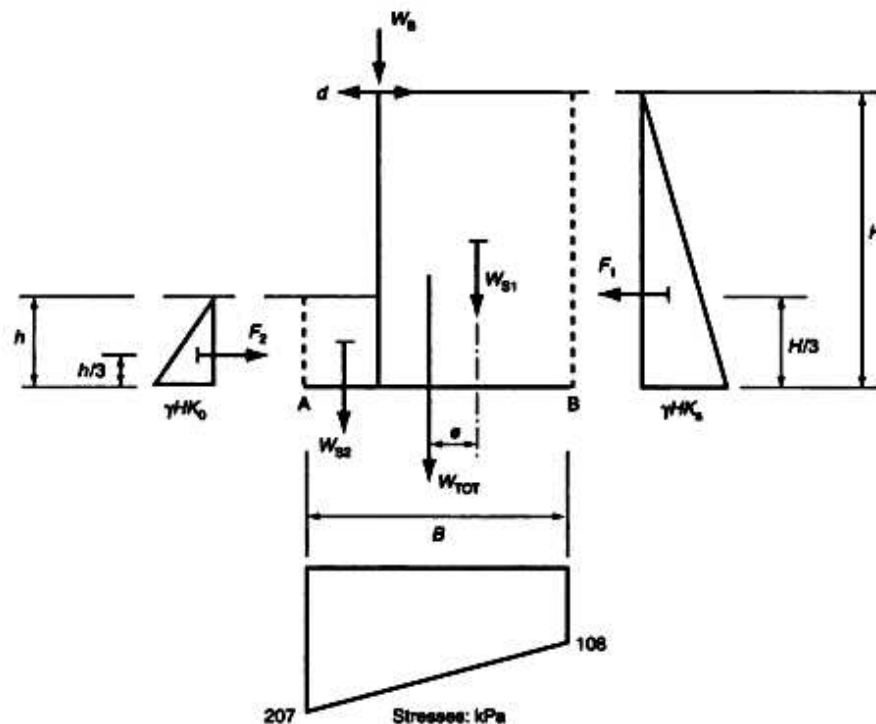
Loading details for the abutment footing and the initial stresses below the footing. The abutment is located 1 m in from the front of the footing
